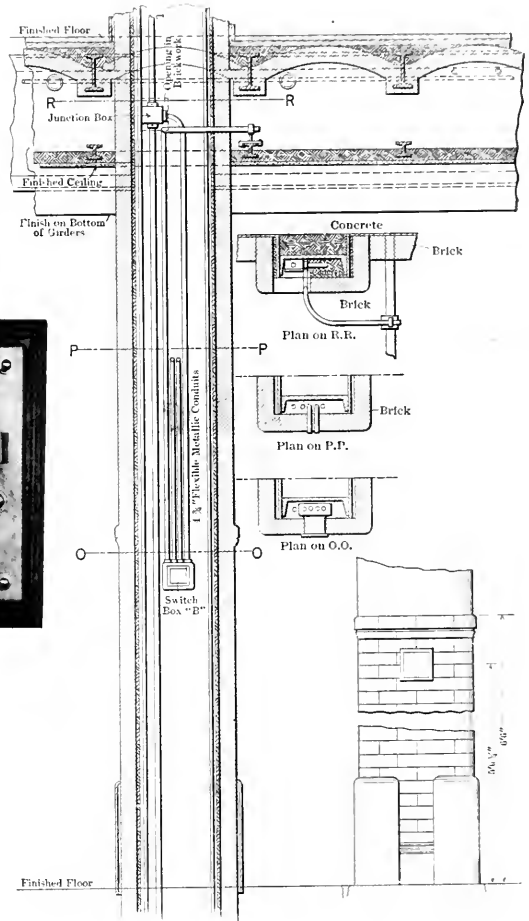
SECTIONAL VIEW OF COLUMN, WITH CONDUITS AND SWITCH AND JUNCTION BOXES.
